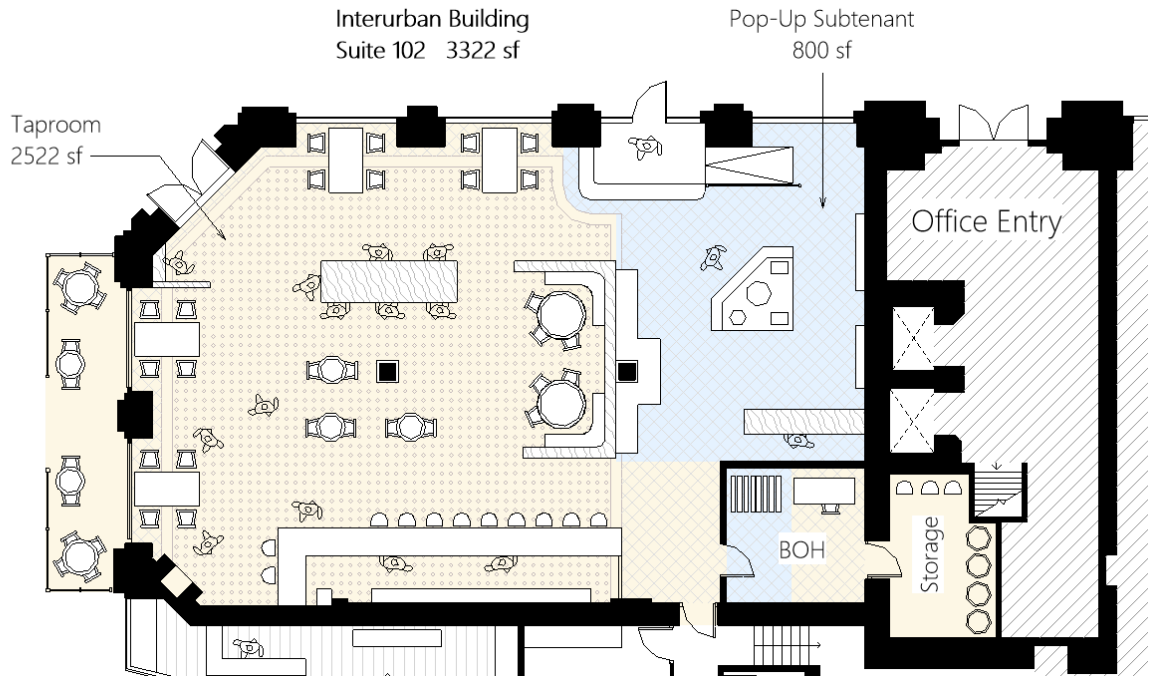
Floor plan of Interurban Building Suite 102. Refer to Appendix F for full plan.
